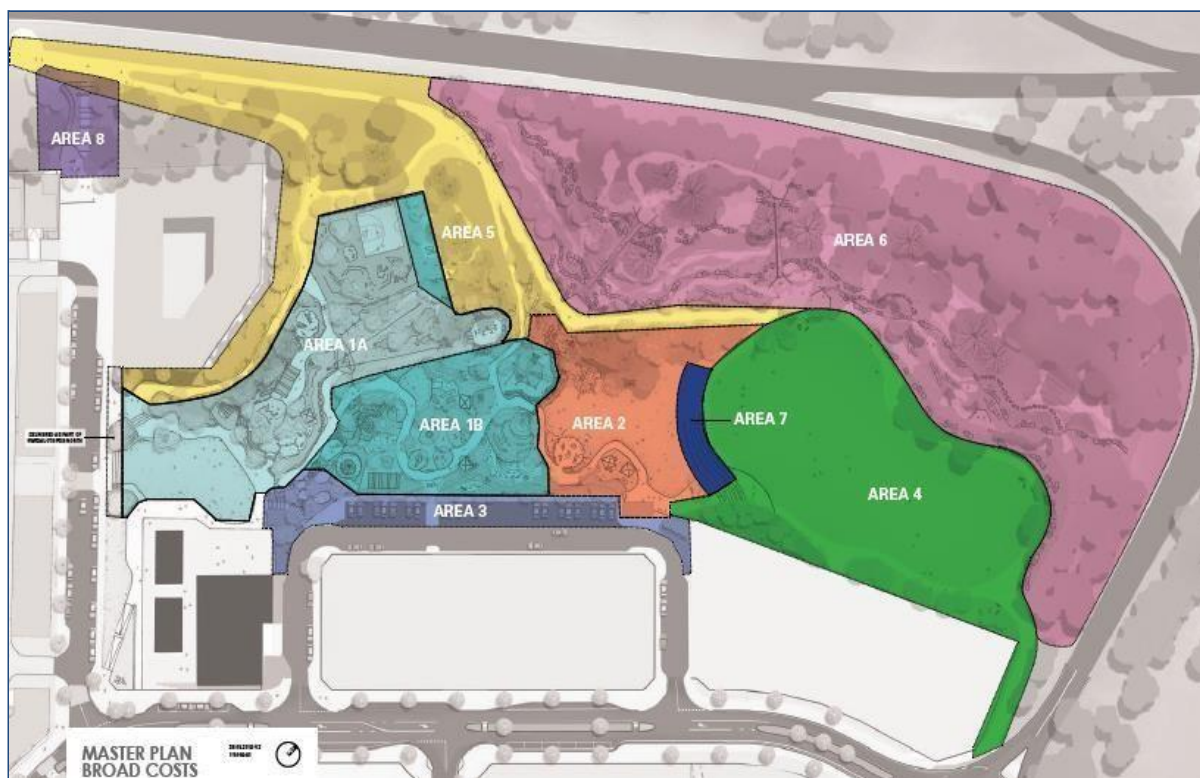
Stages of public open space construction (concept design by Playstreet)
